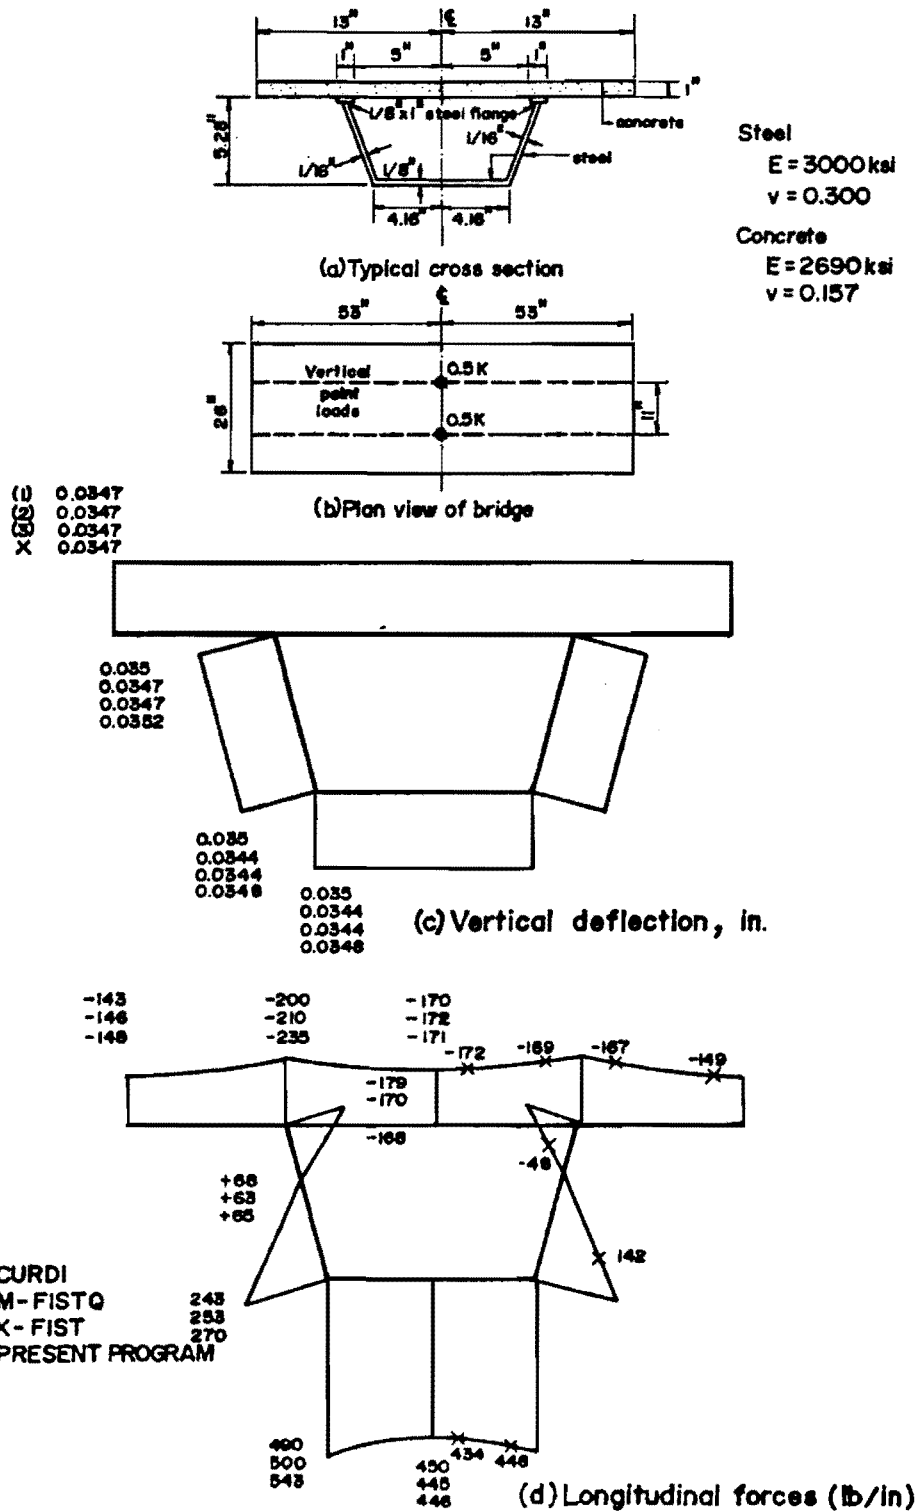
Example 5: box-girder bridge (results at midspan)
